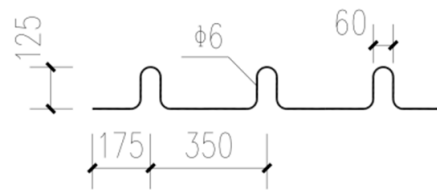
Schematic diagram of combined stirrup rebar (unit: mm).
